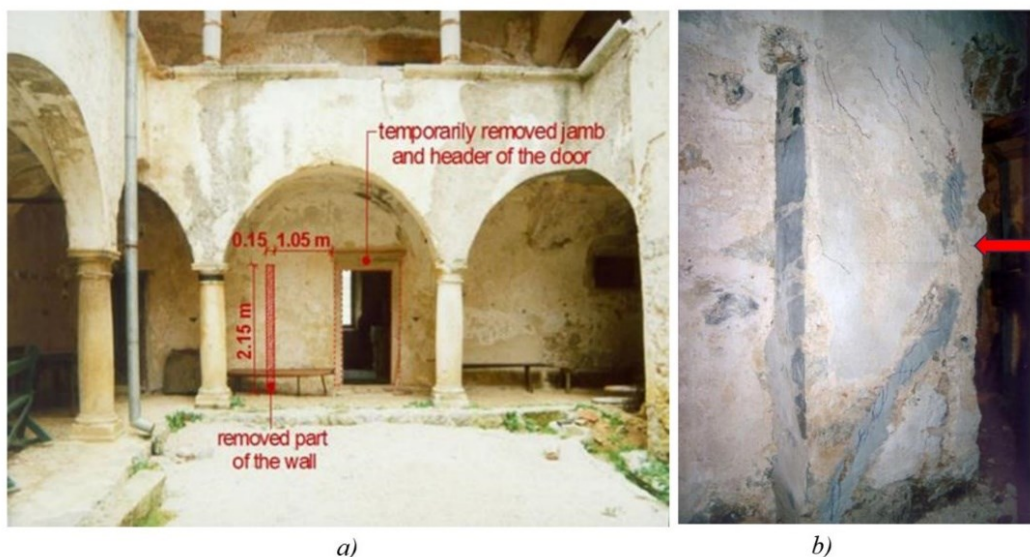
In situ test of a wall in Gracarjev turn Castle. a) Selection of testing location; b) Diagonal cracks in the wall after the end of test. No horizontal cracks at the ends of the wall are visible
